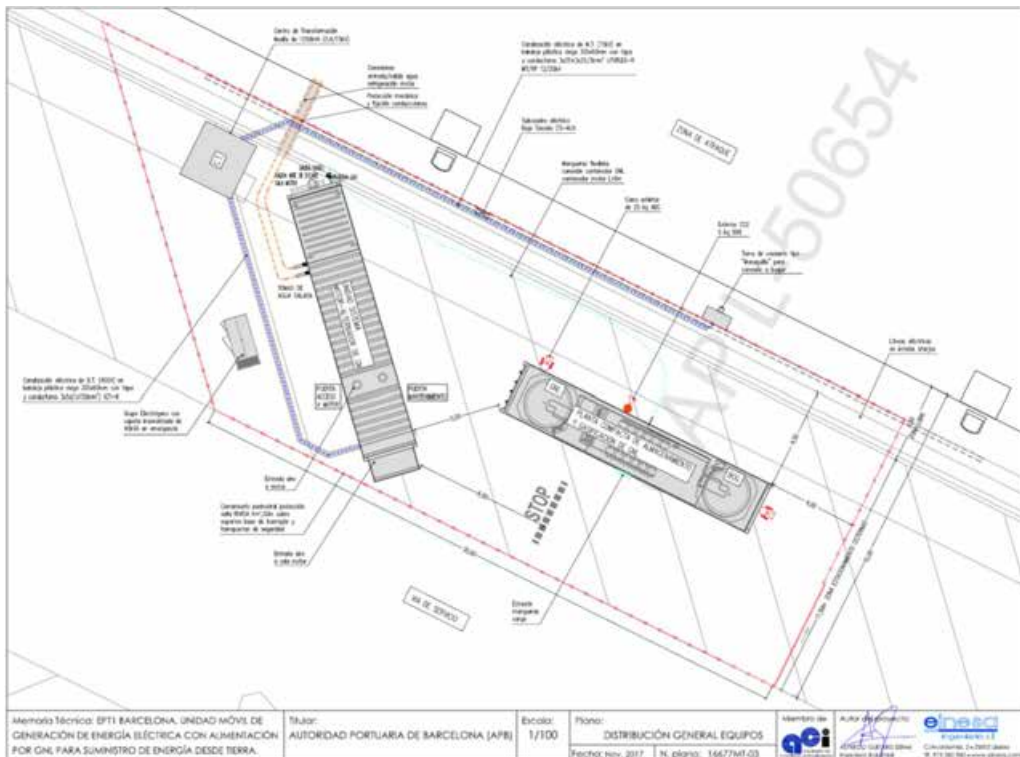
Pilot location. Ponent wharf. Detail of the location of equipment, electrical and gas connections and fencing.
